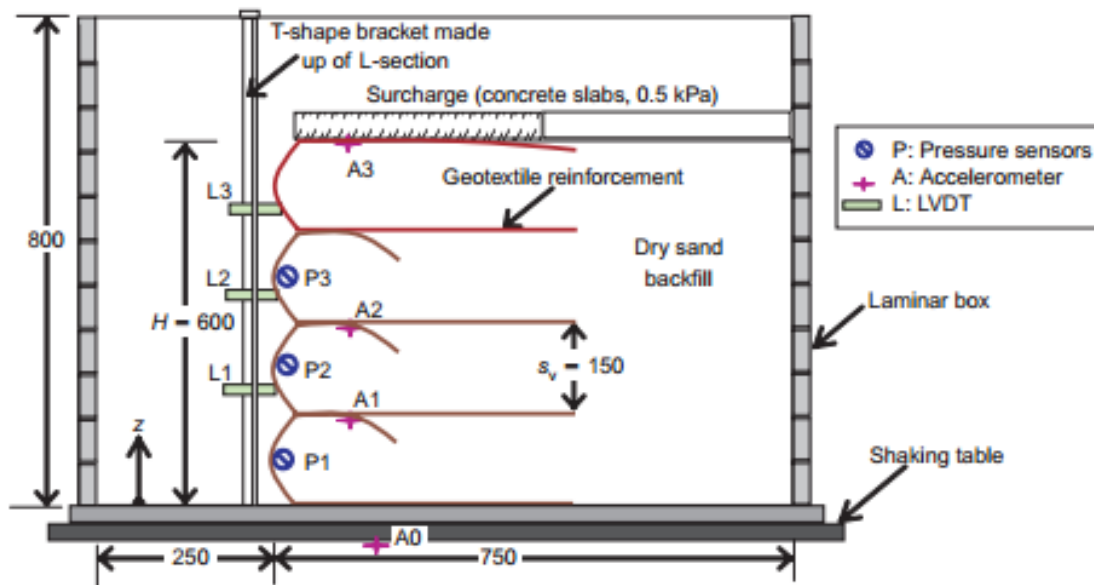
Schematic diagram of typical test wall configuration and instrumentation (all dimensions are in mm) (Krishna and Latha 2007)
